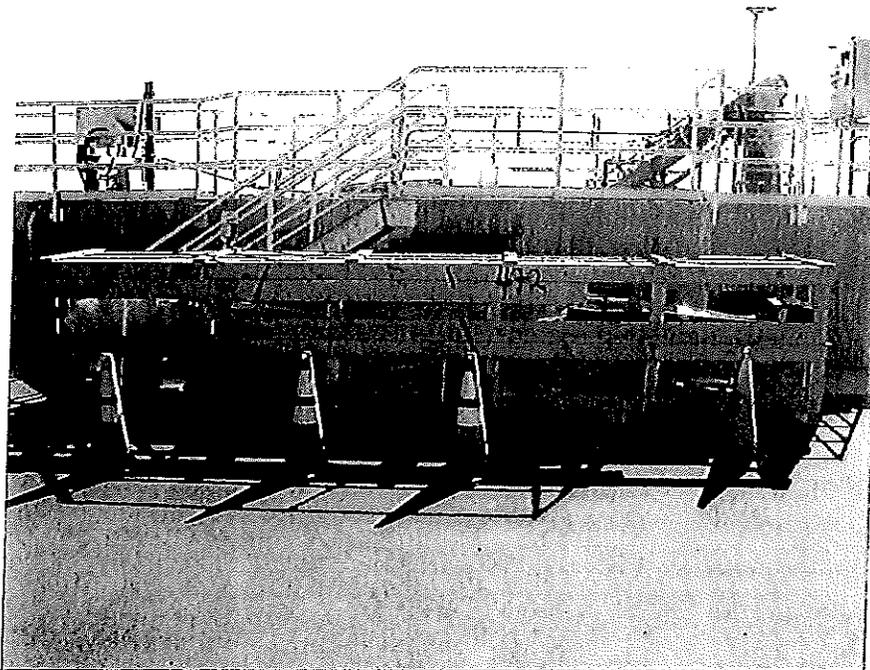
New mechanical bar screen ready to be installed at Plant 2.
